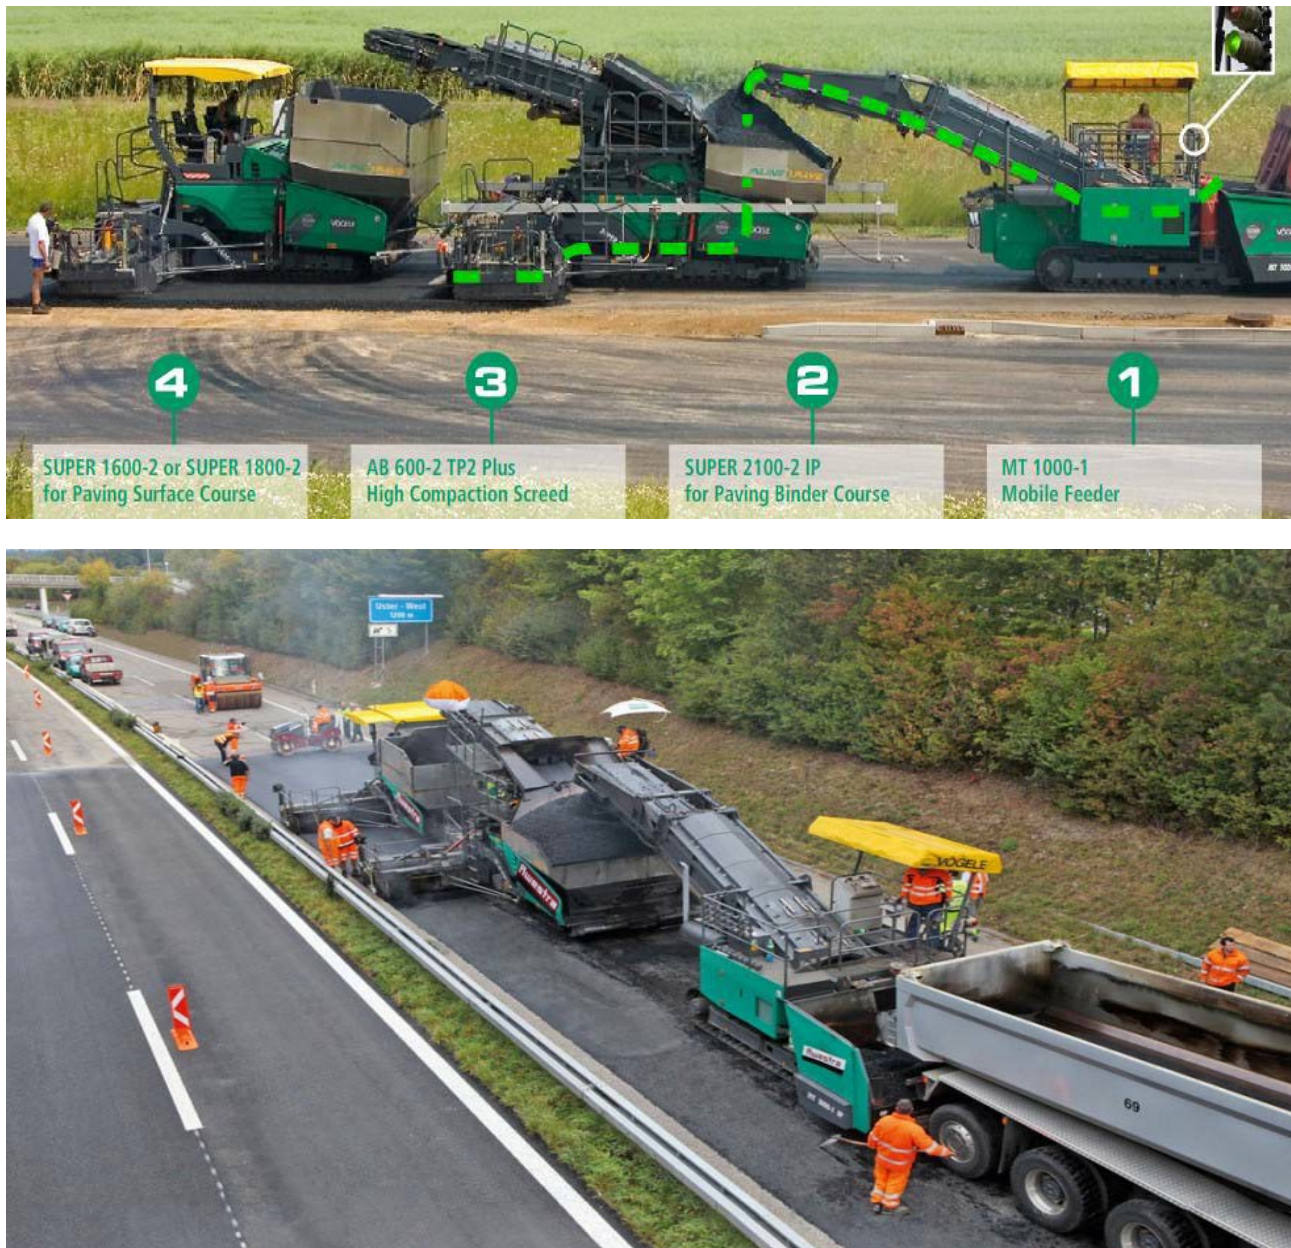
Inline Pave setup (top – side view; bottom – elevated view)
